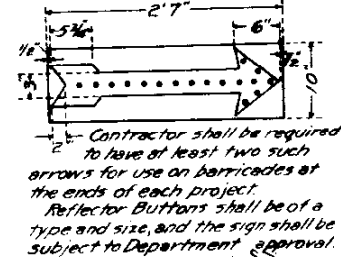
DETAILS OF ROAD UNDER CONSTRUCTION SIGN
